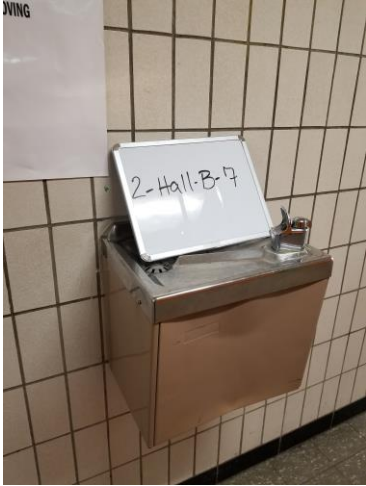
Drinking water fountain, located on the 2nd floor hallway.
